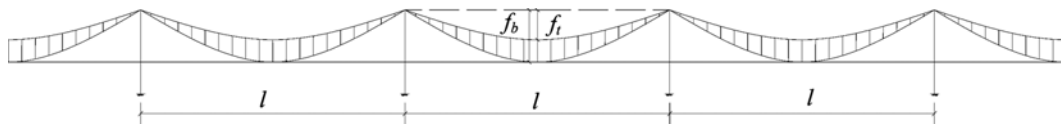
Side view of multi-span suspension bridge with double main cables in the vertical plane
